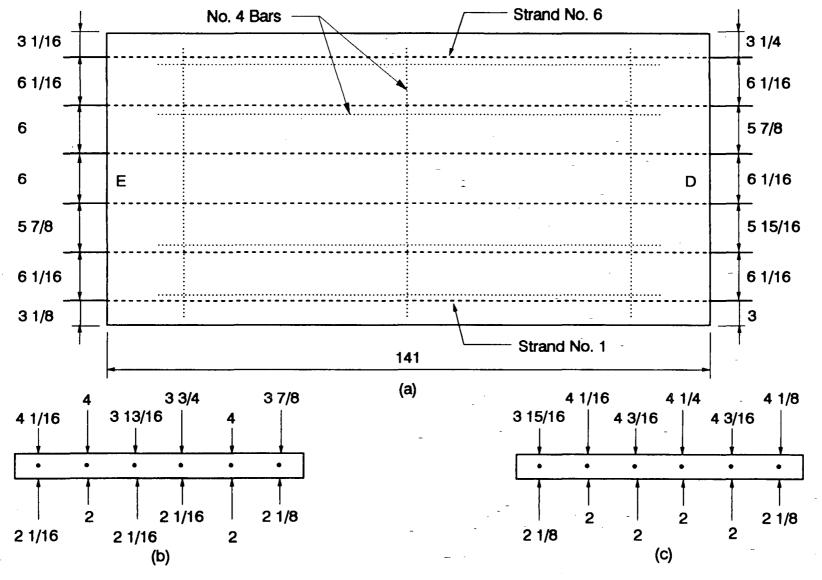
Specimen No. 16-6.0DU-3 (dimensions shown in inches): (a) plan view; (b) end view at E; (c) end view at D
